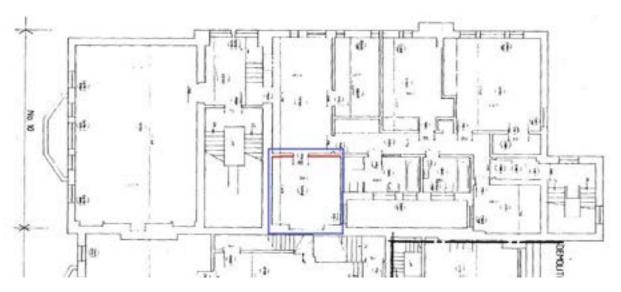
4th Floor Plan -10 Cambridge Gate. Camden Planning Ref: 8970527 from 1989. The room under consideration is indicated. The earlier wall is marked in red.
